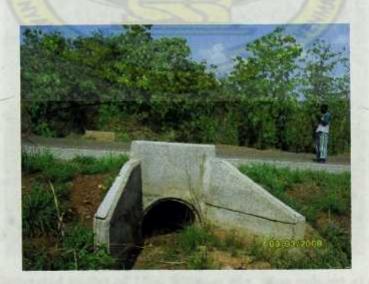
Silted inlet of 1No. 900mm diameter pipe culvert at km 29+525
